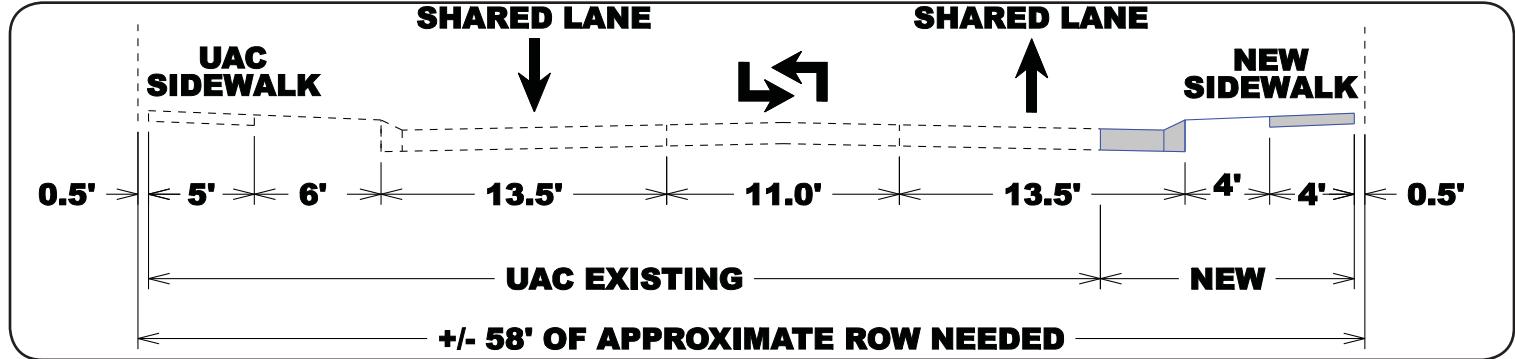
B. ASBURY ROAD WEST OF NORTHWEST ARTERIAL PROPOSED CROSS SECTION EAST OF HALES MILL ROAD
